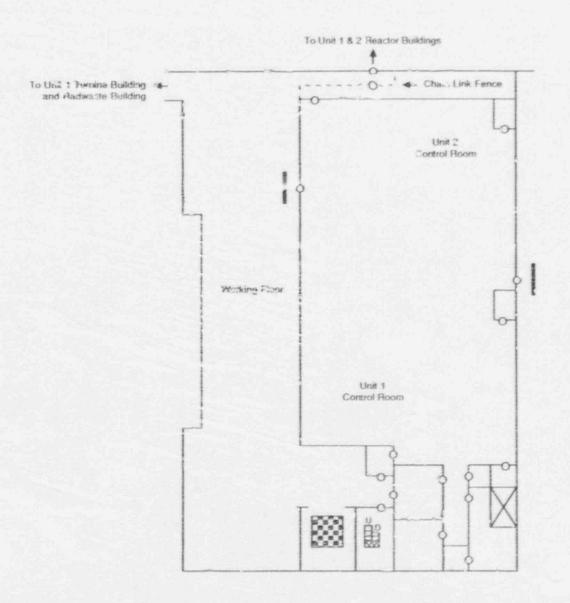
Hatch Units 1 & 2 Control Building Arrangement - Elevation 165 ft.
